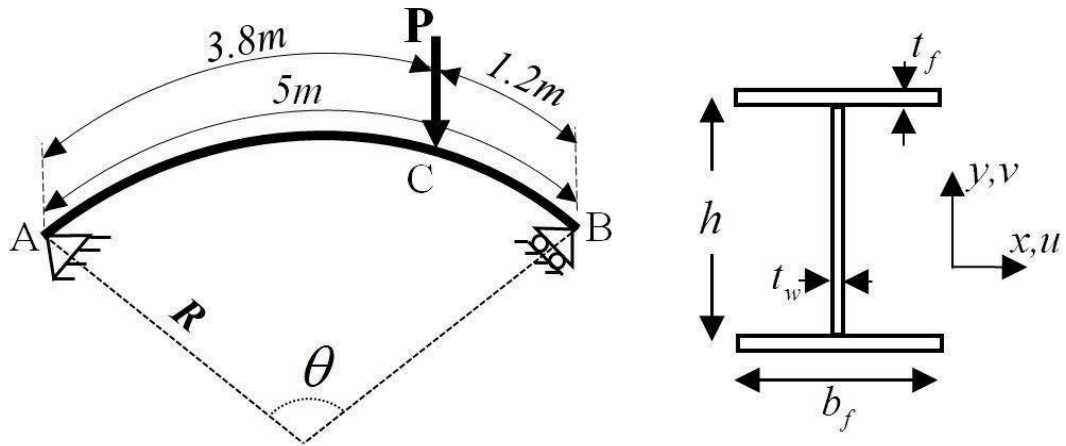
Cross-section, loading and boundary conditions of beams analysed in Example 1.
